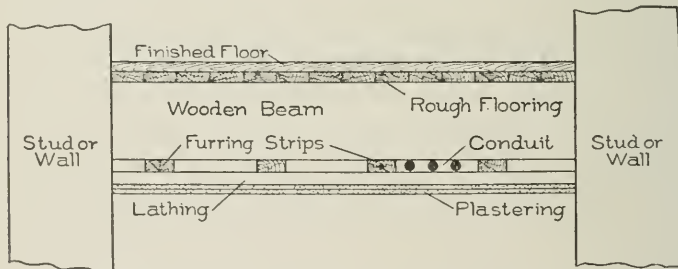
Running Conductors Concealed Under Floor in Wooden Frame Building
